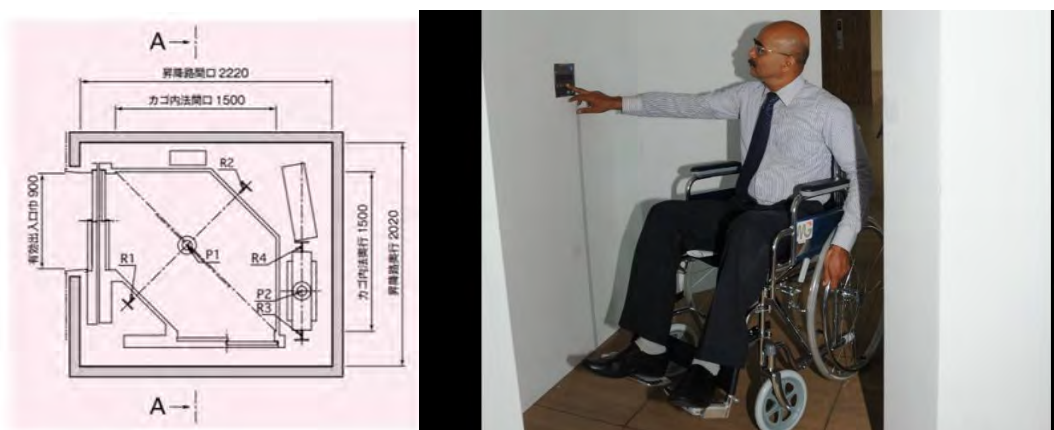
(left) Design of the elevator (right) Mock-up trial of elevator
